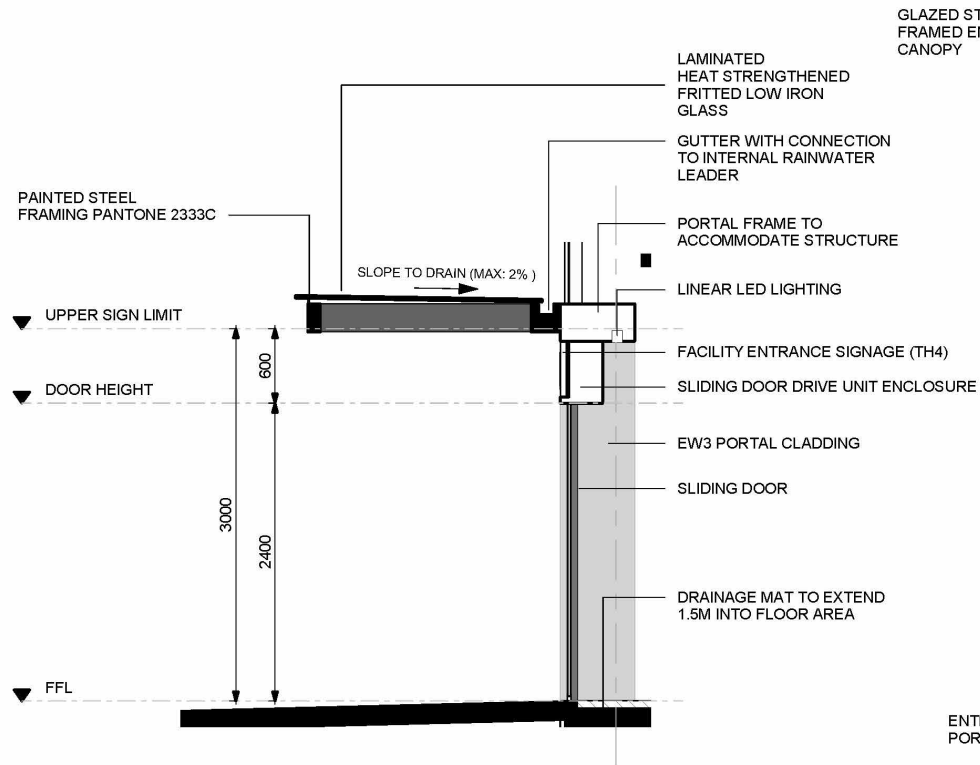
Section through entrance canopy. NOTE: Rain water leader from canopy to be housed within portal frame. Provide access panels in portal frame for clean-out.
